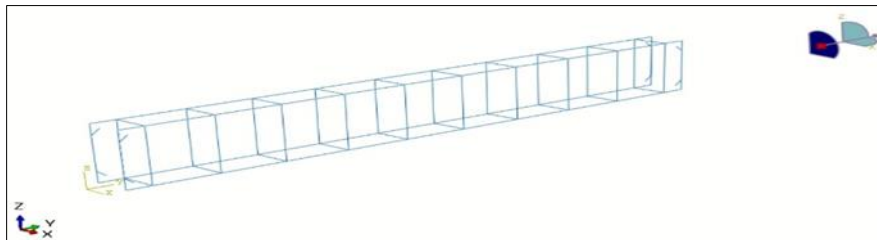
Steel Reinforcement Bars and Stirrups Modeled with Truss Element
